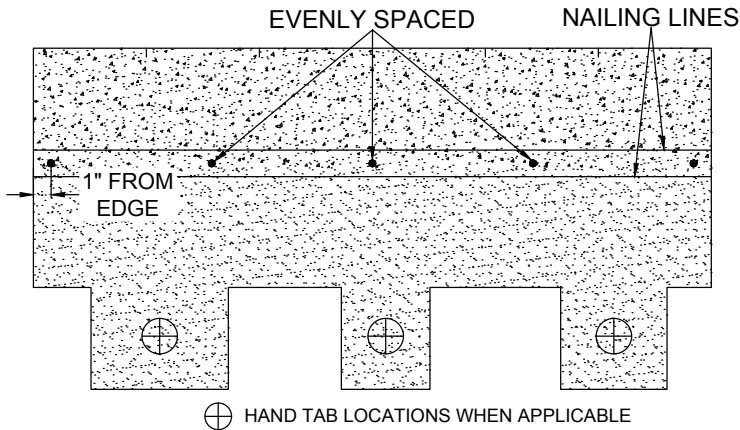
Windsor, 5-Nail Fastening Pattern and Hand-Tab Locations
